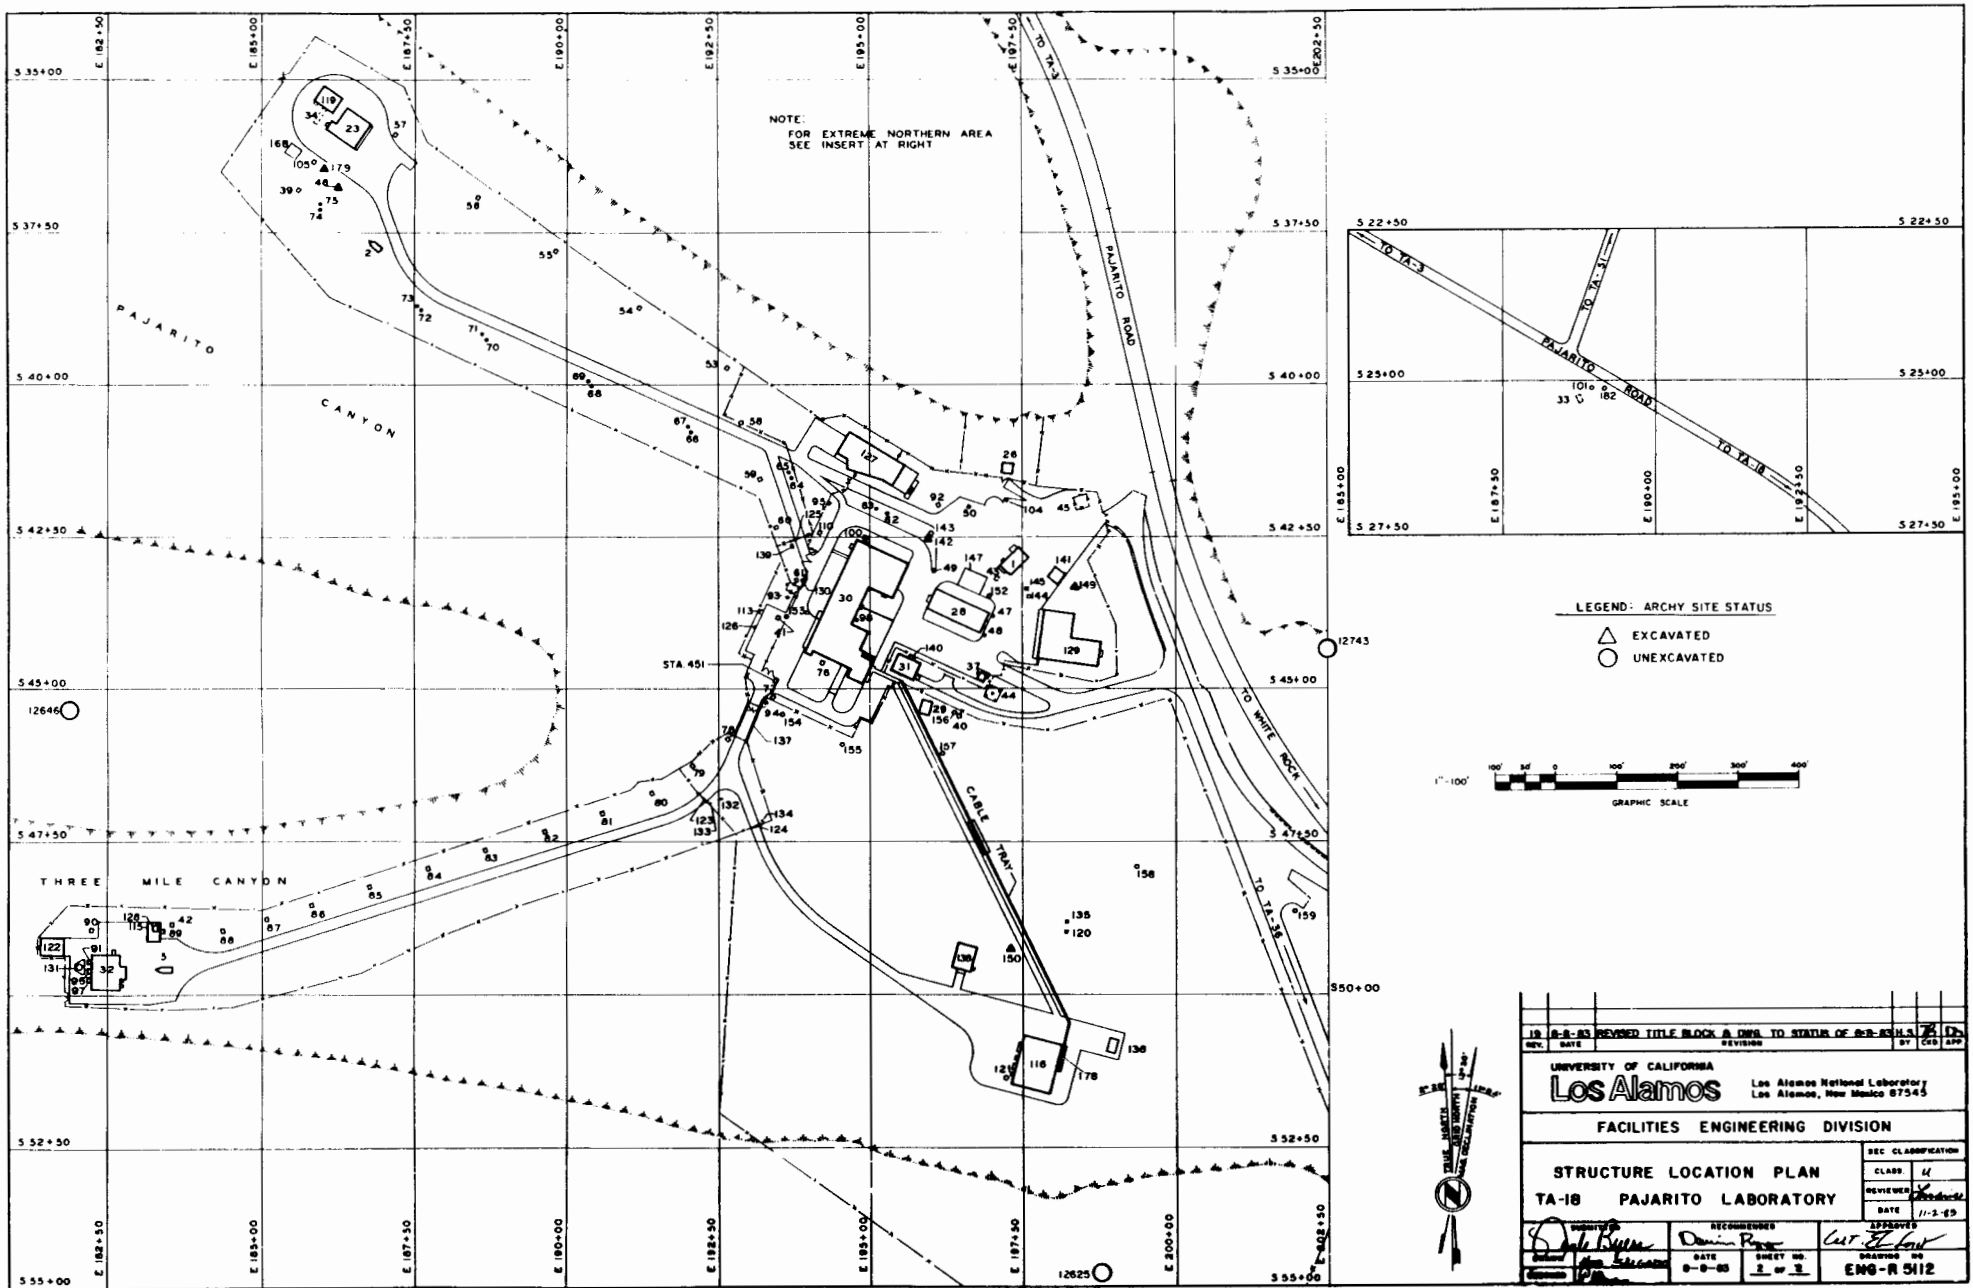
Structure Location Plan for TA-18 - Pajarito Site
